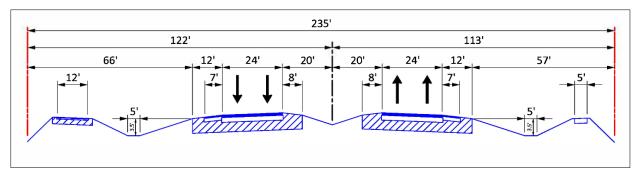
Widening Alternative from Stacy Road to SR 56
